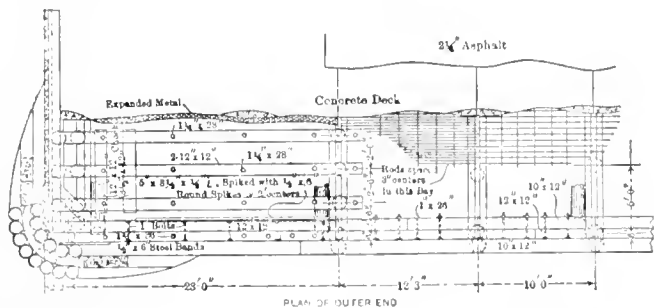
Corner Construction Reinforced Concrete Deck.
